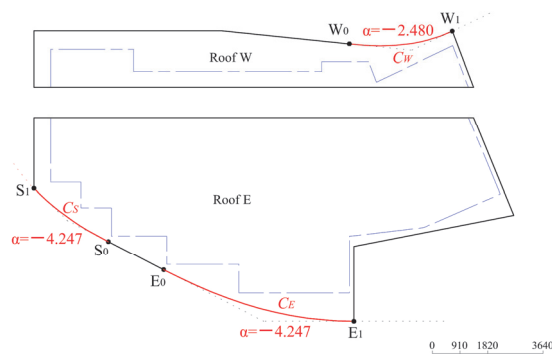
Determined LAC C_W on the plane containing Roof W and LACs C_E and C_S on the plane containing Roof E S=1:250
